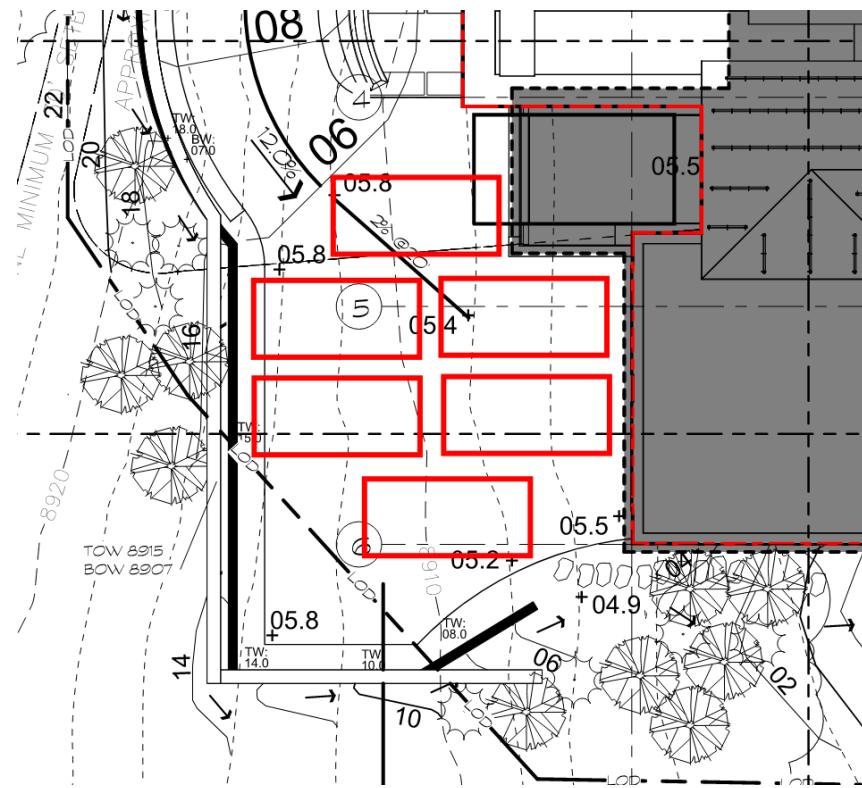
Off-Street Parking Spaces in driveway shown in red.
